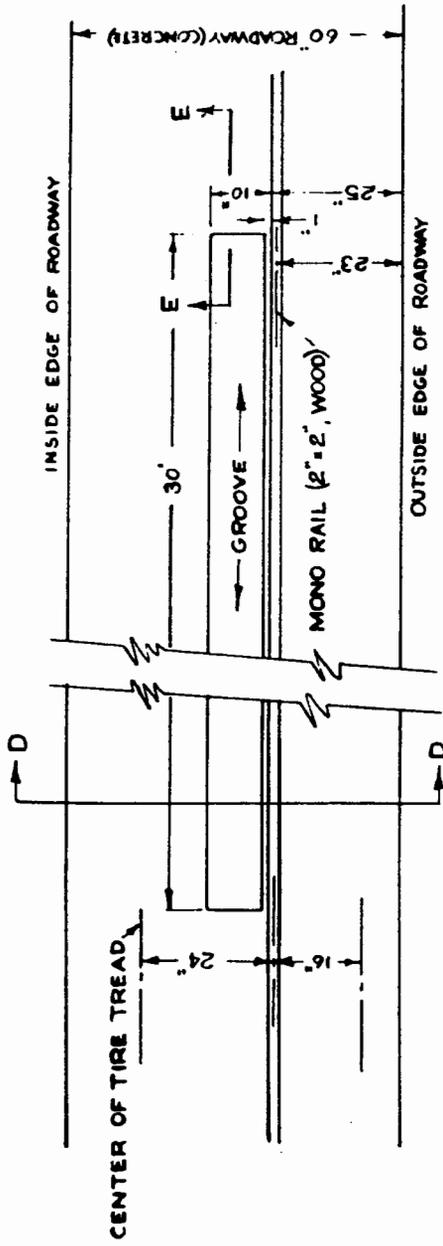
Figure F. Target, Rolling, Machine Gun, Complete C-59725
